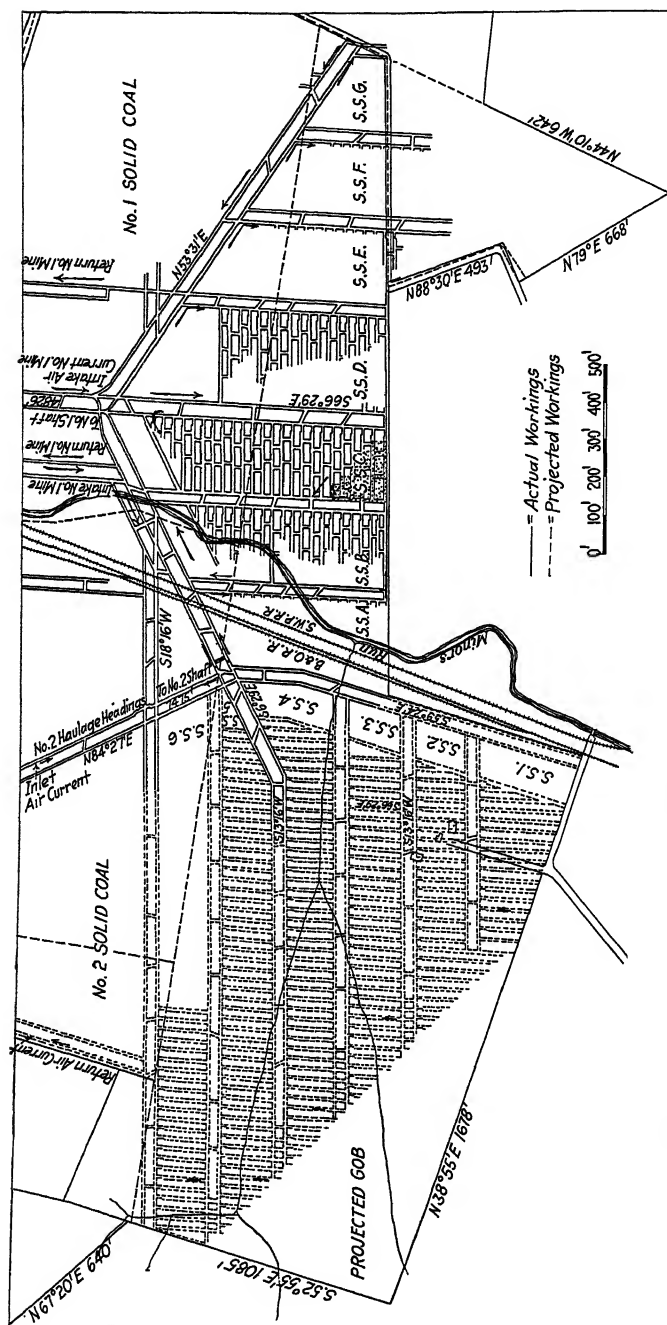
PLAN OF MINING BY THE DOUBLE-ENTRY ROOM-AND-PILLAR METHOD USED PRIOR TO 1900 IN THE OLD CONNELLSVILLE BASIN.
